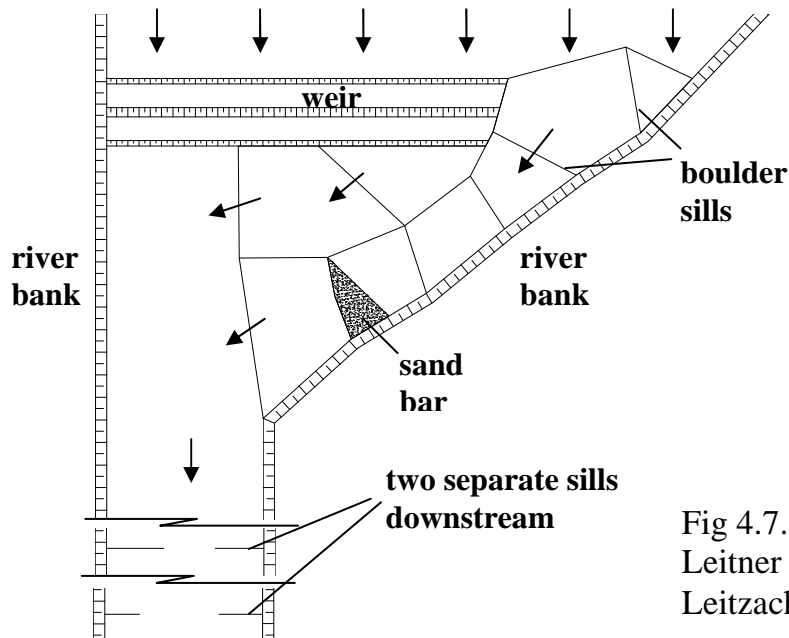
Sketch of the fish ramp Leitner Mühle in the brook Leitzach, plan view
